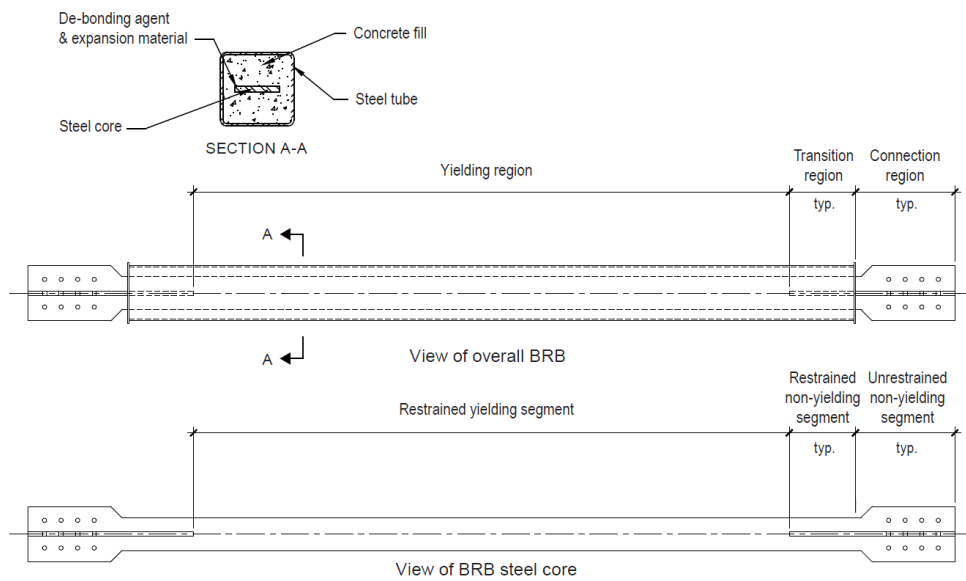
Common BRB assembly (from Kersting et al.^[16])
